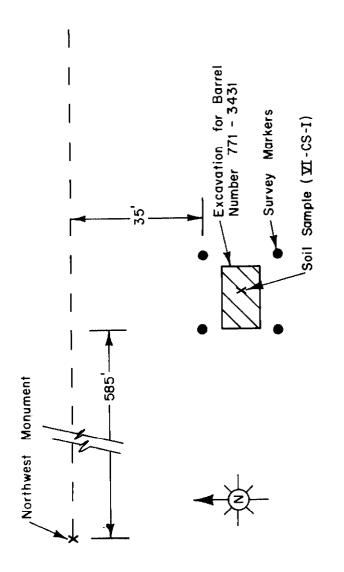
Pit 10 excavation for special Barrel No. 771-3431.
